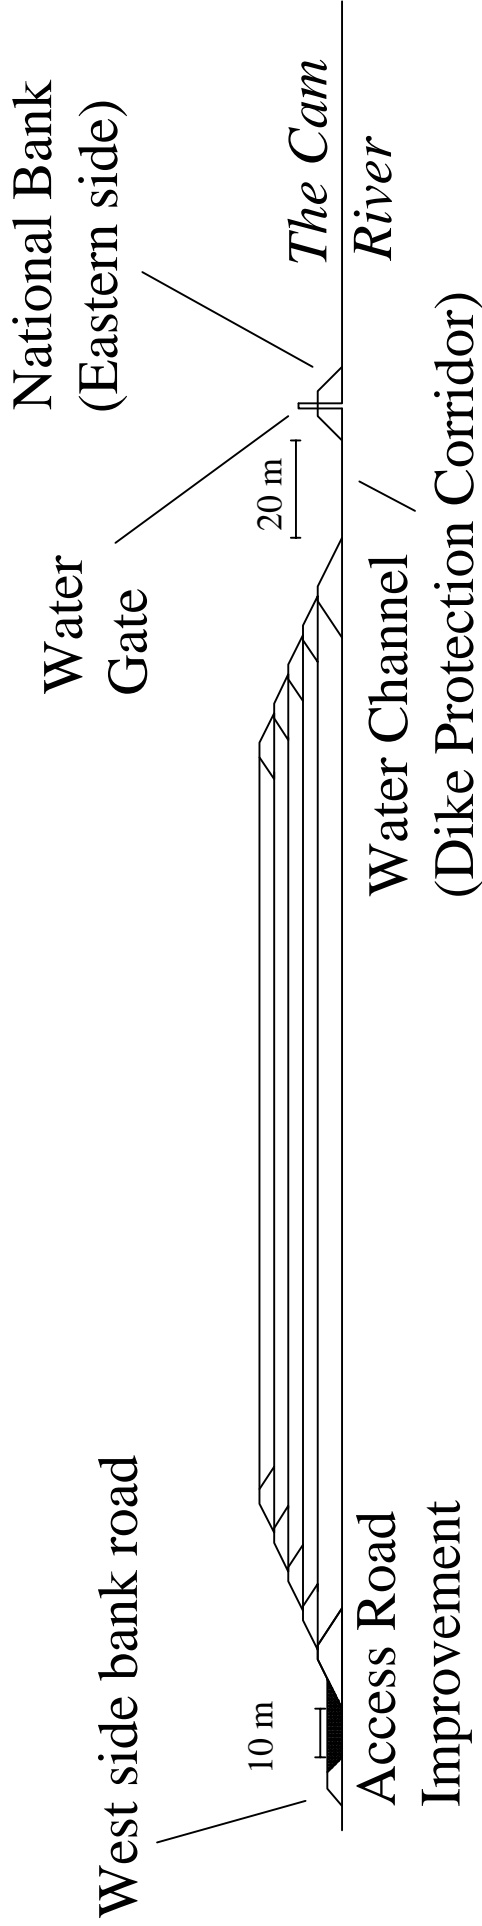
Cross-section of Landfill site at Final Stage
